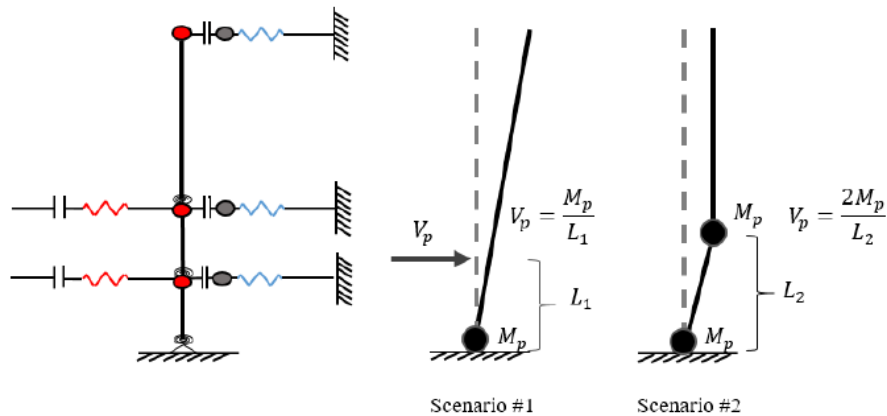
Shear strength of the moat wall using plastic design (Sarebanha 2018)
